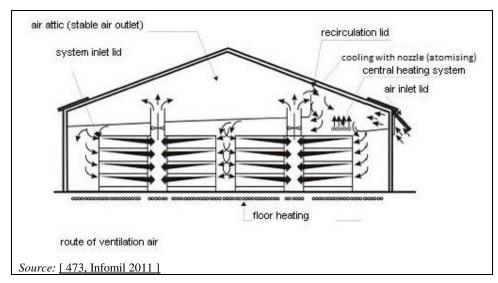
Schematic cross section and principle of a tiered floor system with forced drying for broilers
